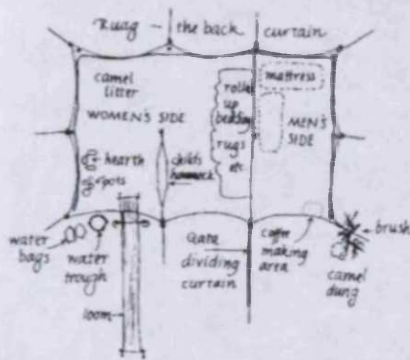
Bedouin Tent Layout and tent sitting in summer, where the wool partition end walls often removed to allow for crossing ventilation. Source: Faegre and Government of Riyadh ^(4-7, 4-24).
